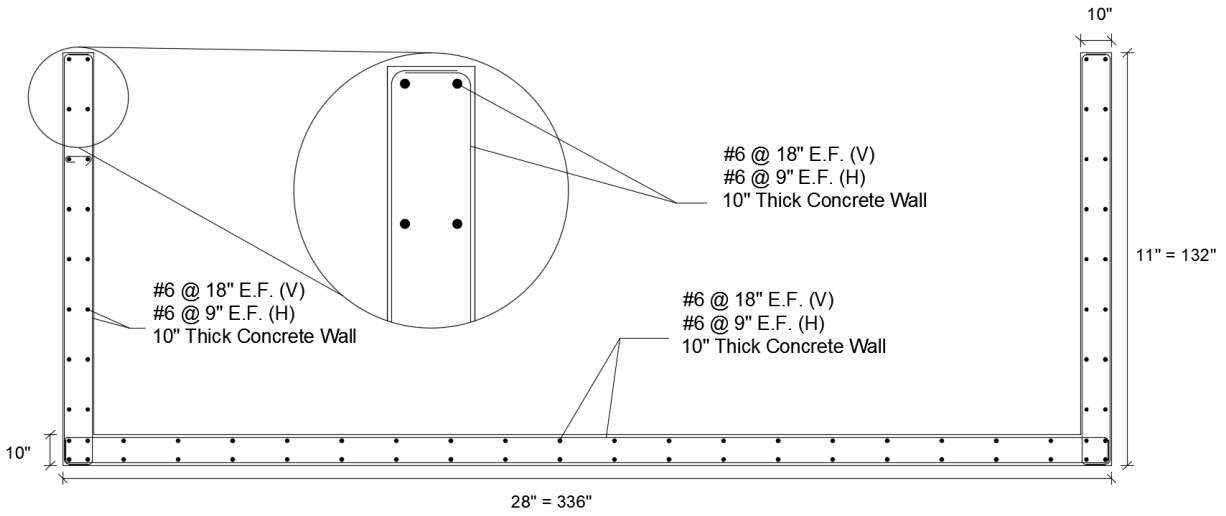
Original Elevator/ Mech. Room shear wall cross-section at the 3rd floor level
